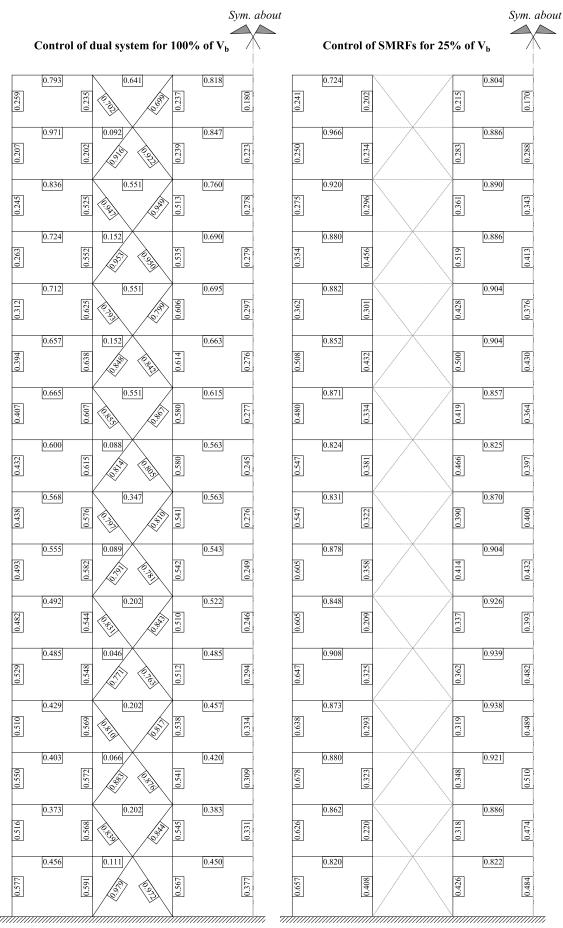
The P-M ratio of designed cross-sections of 16-Story building archetype
